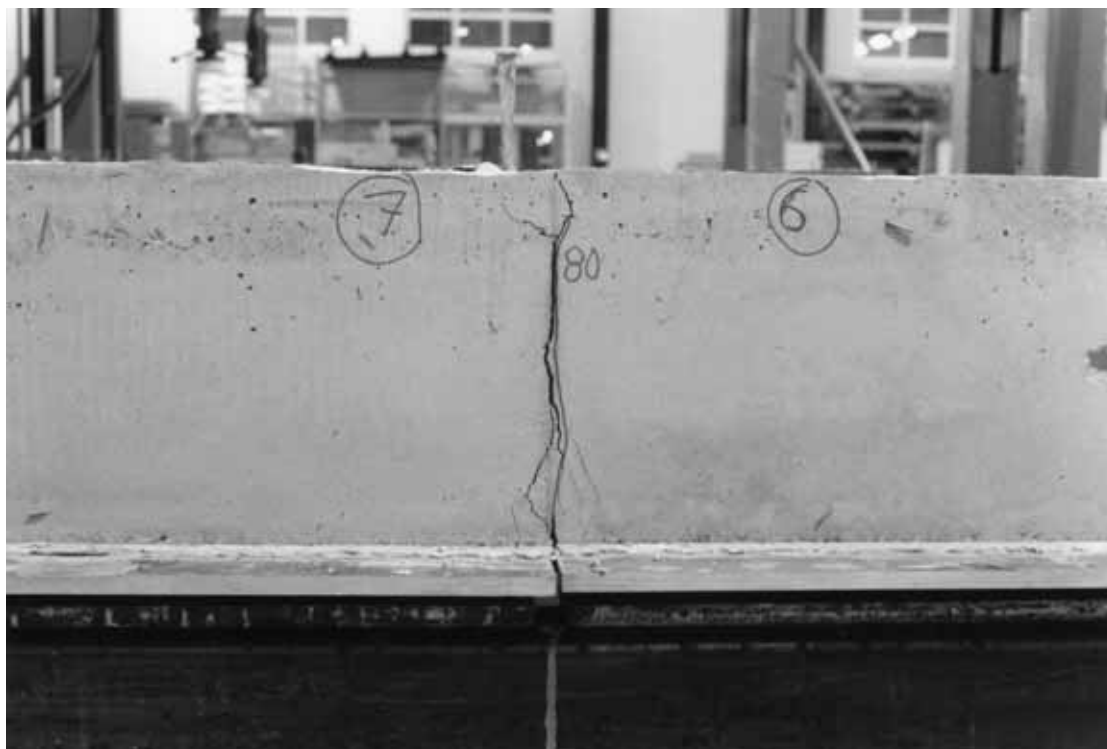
Cracking pattern of tie beam at end of slab units 6 and 7 at failure of the floor.
